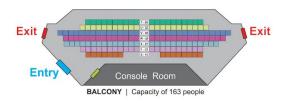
Auditorium Layout [Image Source: NCUI, Brochure]
